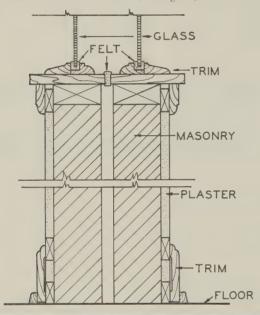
Detail of sound insulating window construction, showing complete structural separation of double wall.
